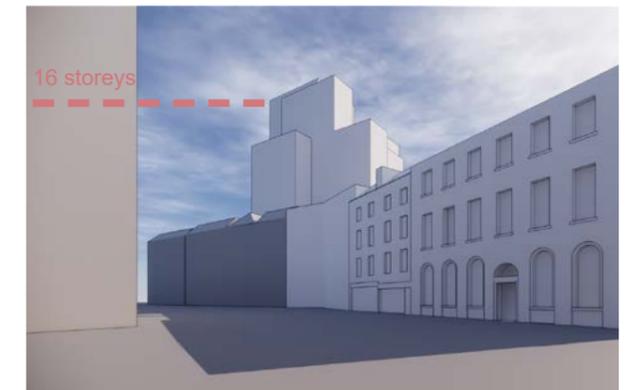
View D from O'Connell St. to north east with 16 storey building to Bank Place. Provides additional visual prominence and landmarking
